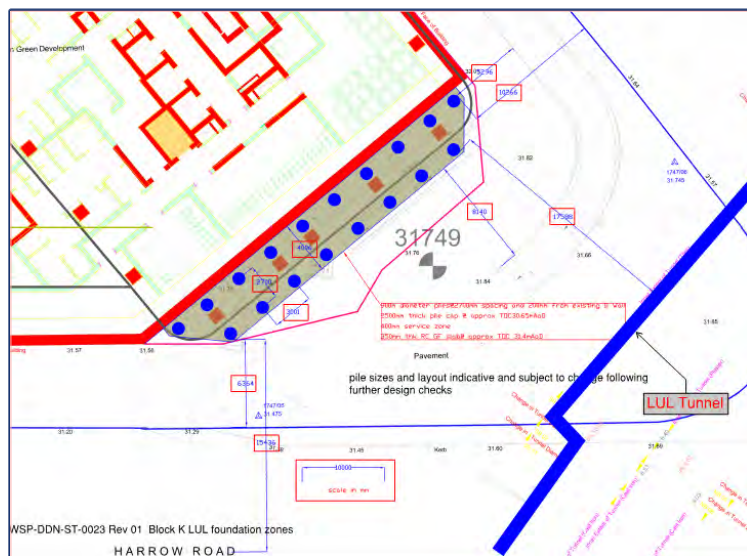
Plan- LUL Tunnel and Proposed structure
